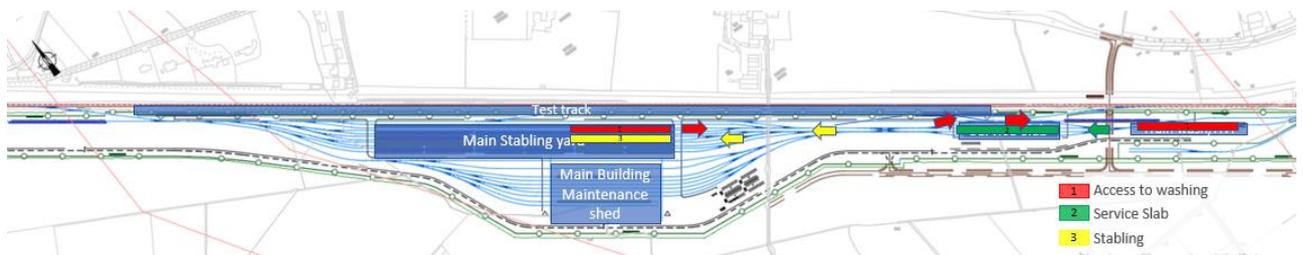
Movement 3: stabling → service/washing → stabling (Alternative 5)
